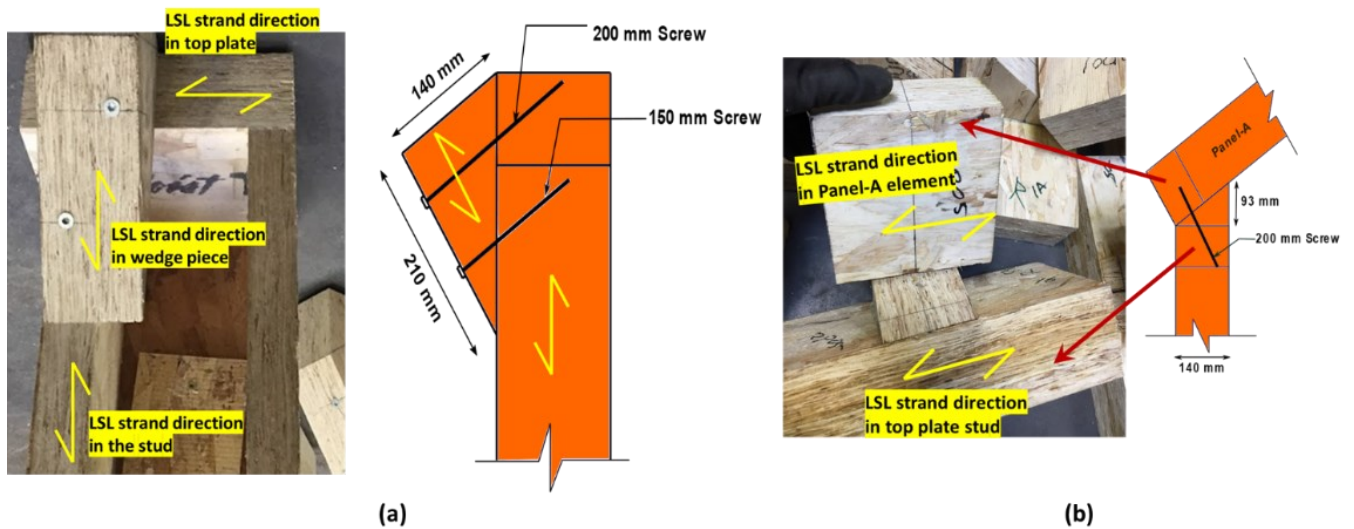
Strand direction in the (a) Connection-B, (b) Connection-A.
